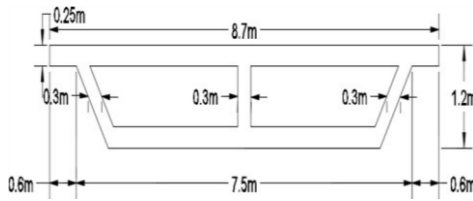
Cross section of Trapezoidal Double cell Box Girder.
